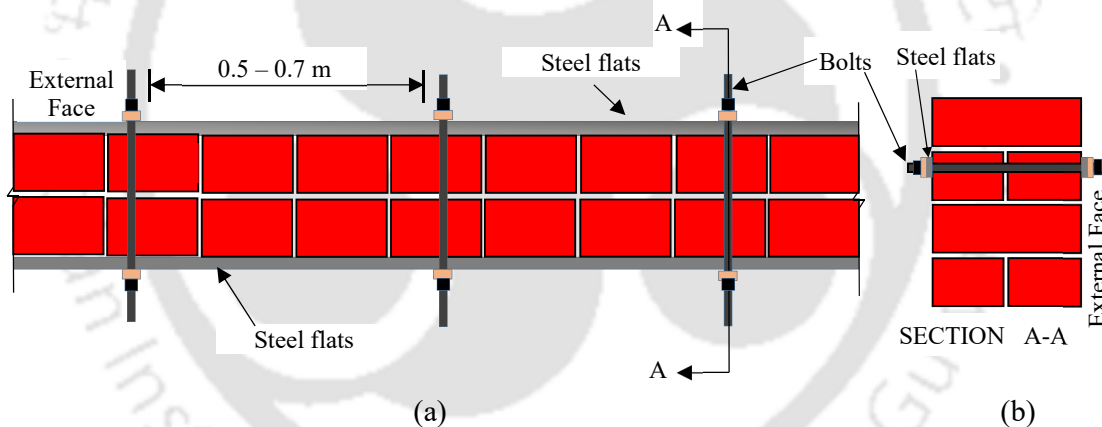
Details of surface-mounted steel flats: (a) wall section in plan (b) wall section in elevation.
